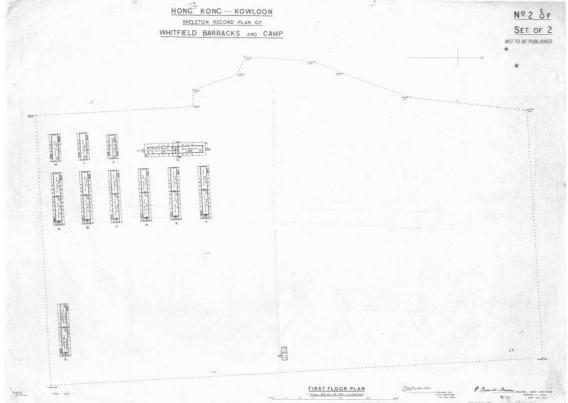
Hong Kowloon, Skeleton Record Plan of Whitfield Barracks and Camp, Ground & First Floor Plans, 1926. (Source: Public Records Office, File No. HKRS913-1-119)
